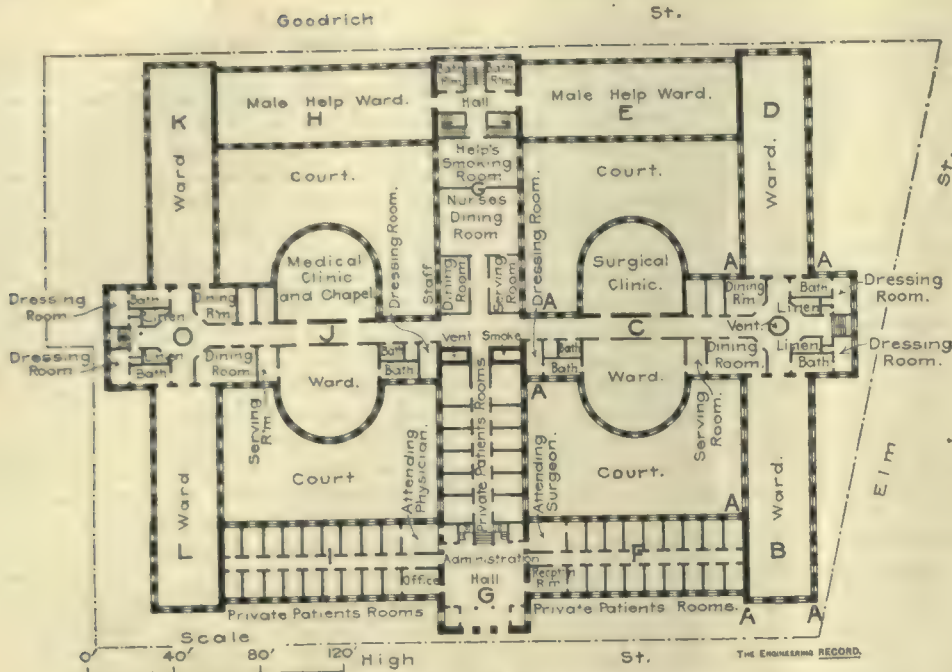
GENERAL PLAN OF NEW BUILDINGS.
